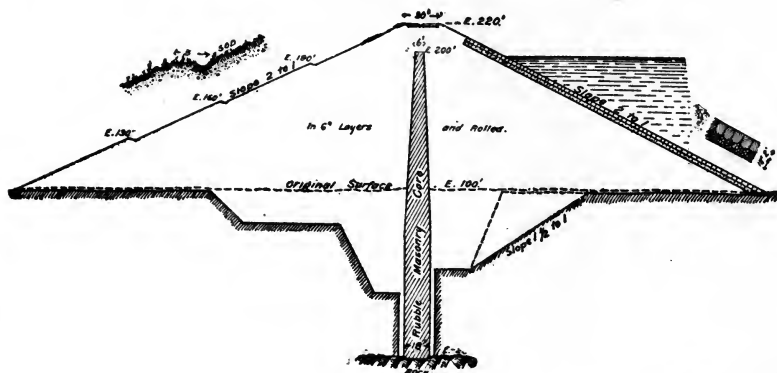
CROSS-SECTION OF EARTH EMBANKMENT. NEW CROTON DAM, CORNELL'S.
